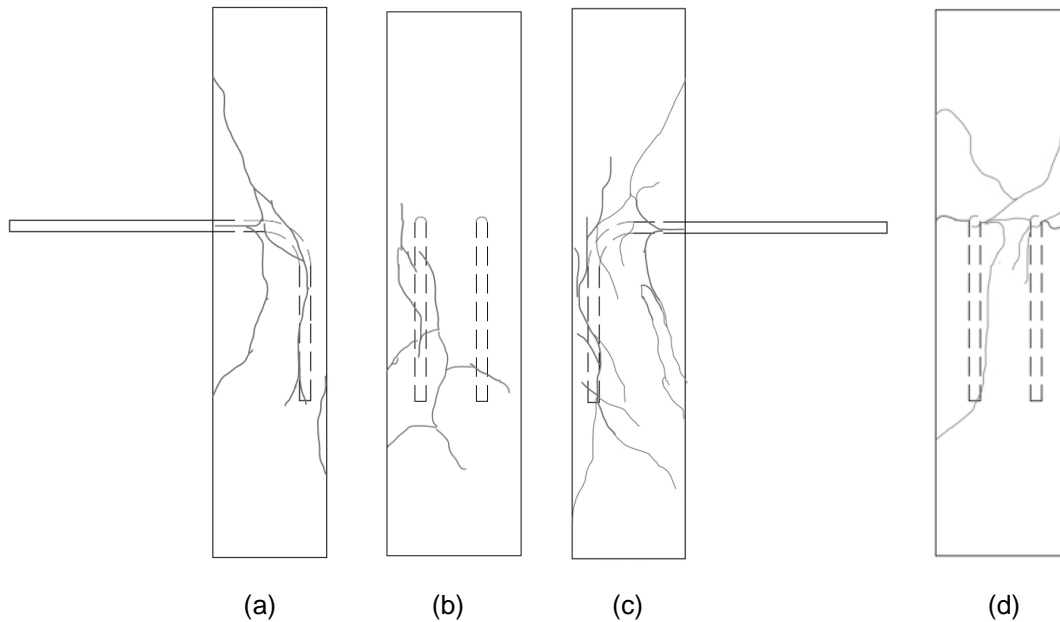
Crack pattern at failure for the specimen containing 90° hooked plain bars: (a) west side face, (b) back face, (c) east side face, and (d) front face.
